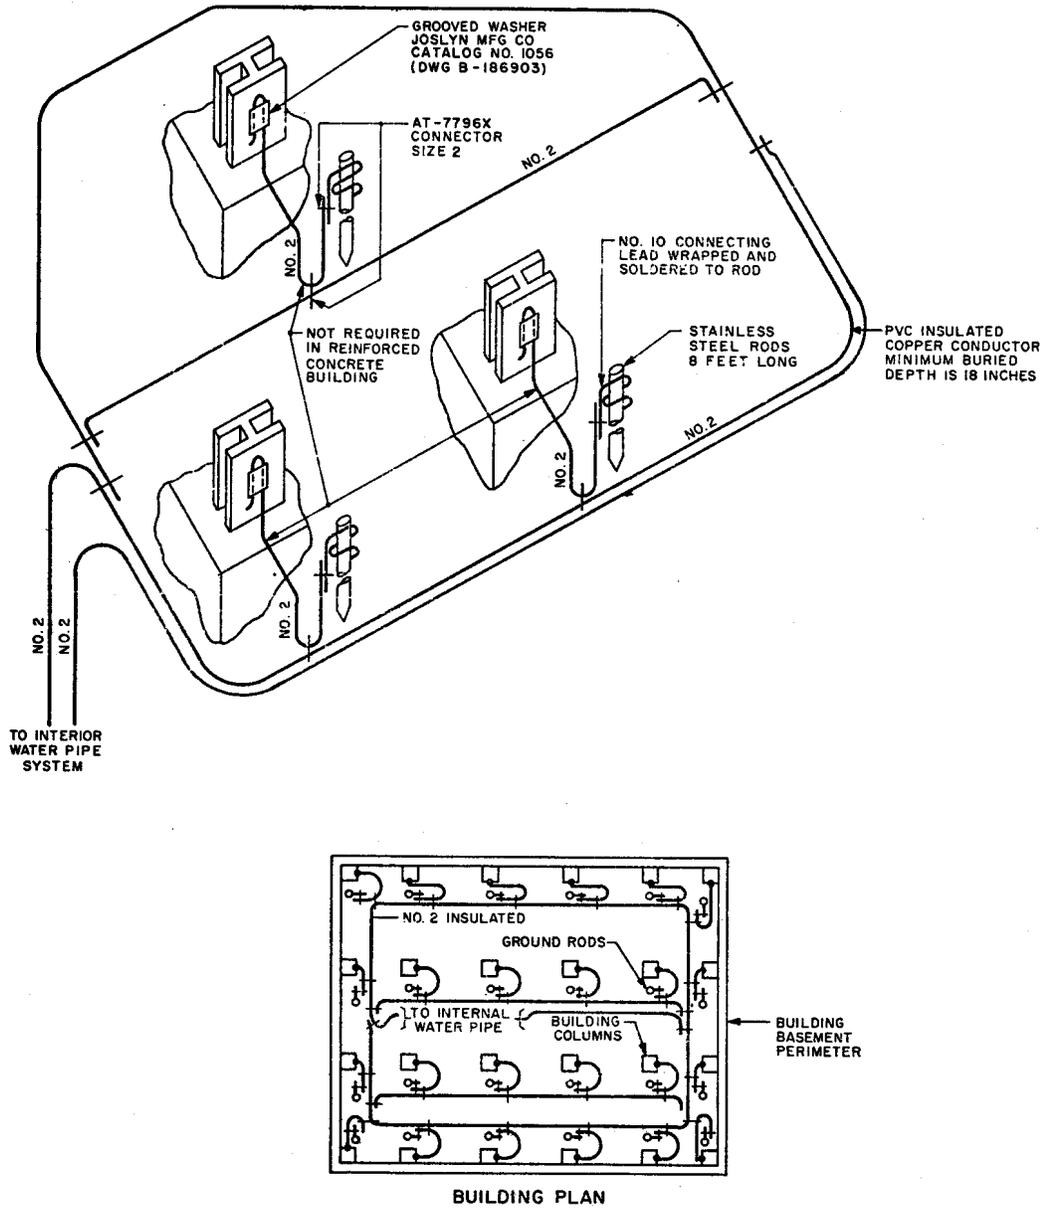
Typical Supplementary Ground Field - Structural Steel And Reinforced Concrete
